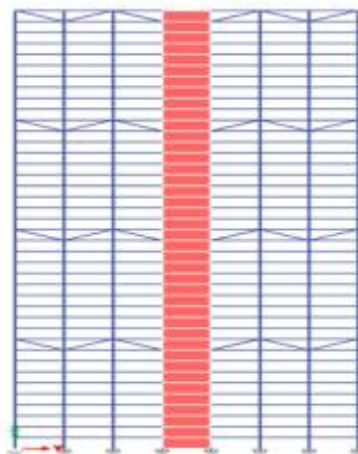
Sectional view for 40 Storey with core wall and outrigger at $0.5H+0.25H+0.75H+H$.
